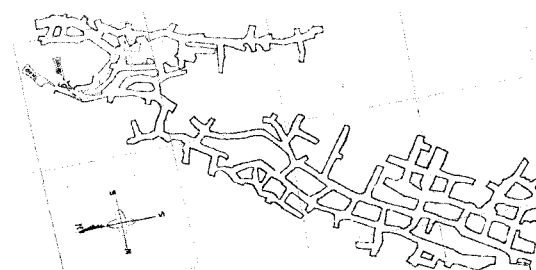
Underground mine development plan of Pyunghae limestone mine (Level-80 ML)
